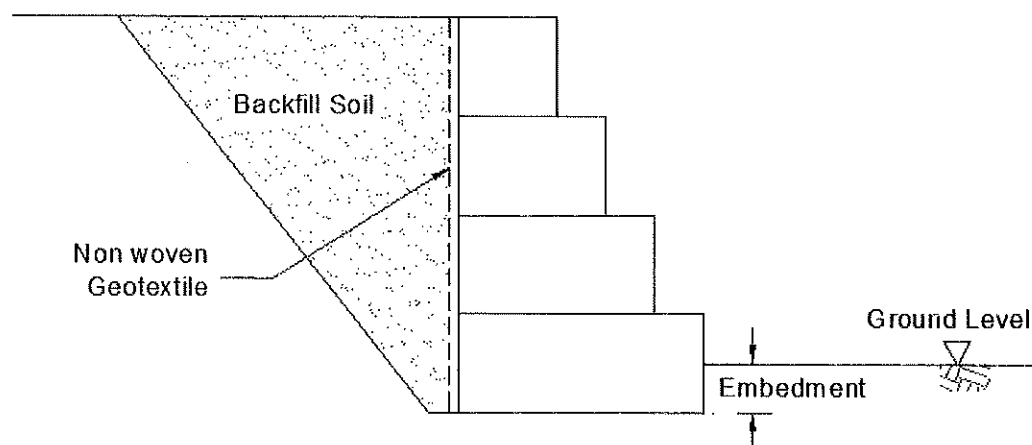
Typical Cross Sections of Gabion Wall with Stepped
